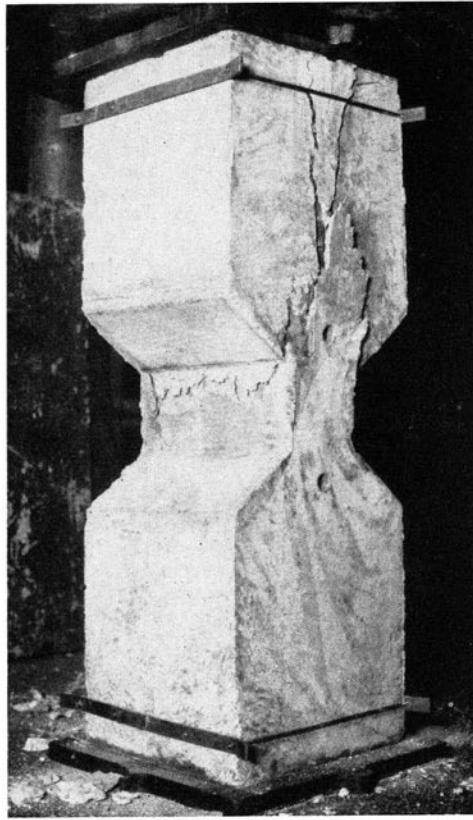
(a) HINGE SPECIMEN AFTER TEST TO FAILURE
